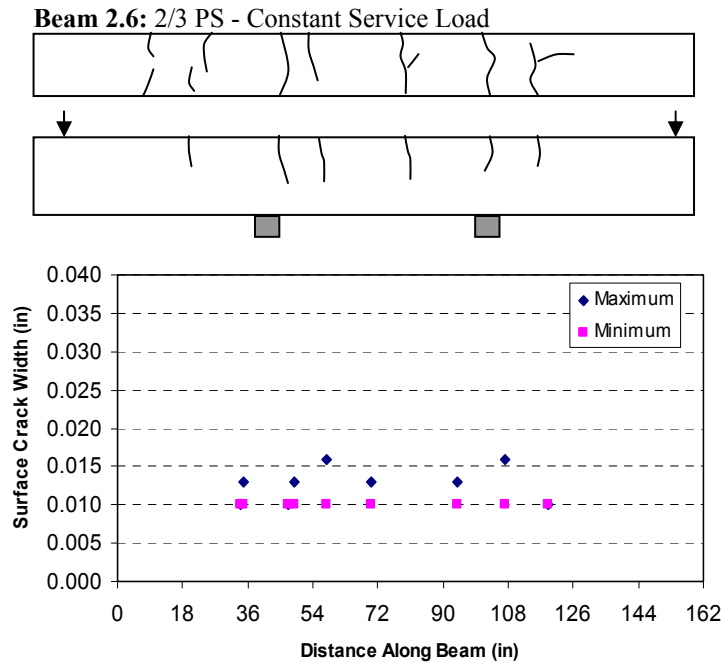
Final Crack Pattern and Measurements – Beam 2.6
